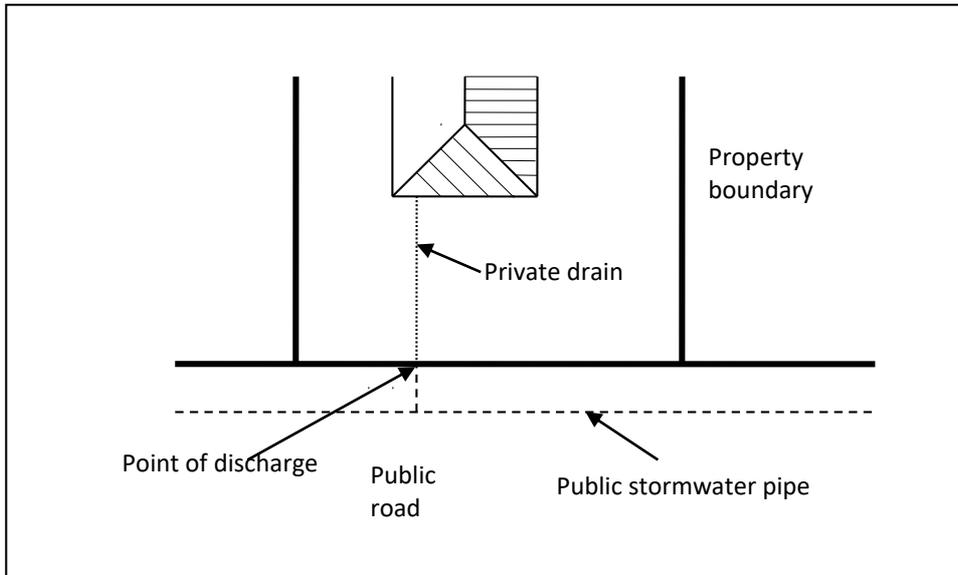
Point of Discharge Location - With Street Frontage To Public Stormwater Pipe
